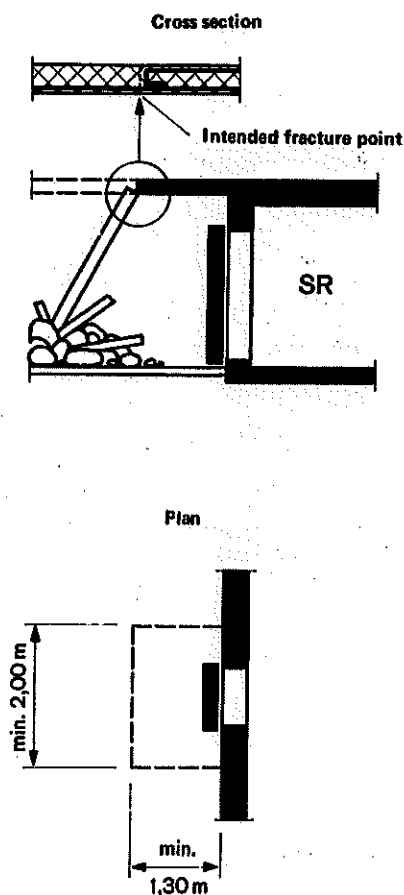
Cantilever slab safe against air blasts as protection of the entrance door against falling debris.
